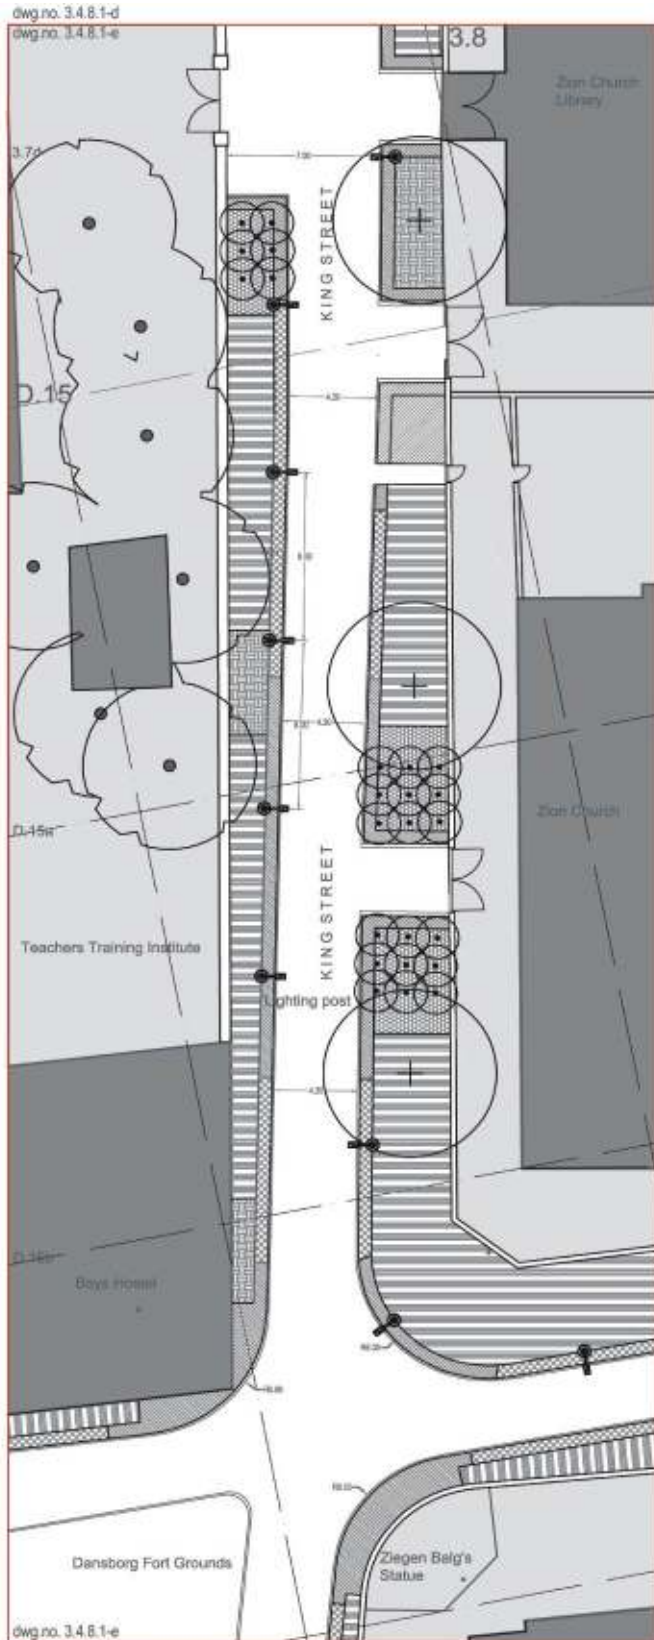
Street edge design and planting layouts such as this drawing were prepared for all major streets
